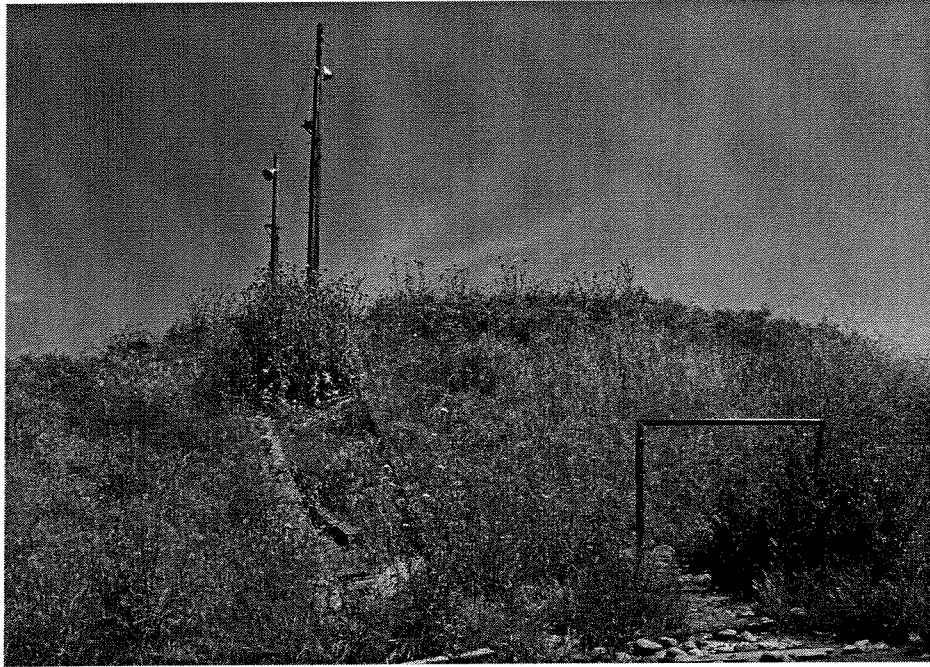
Test Area and Support Building (Unit 95), surrounded by earthen berm, Sigma Test Area, 1956-1961. Looking north. View of May 2005.
